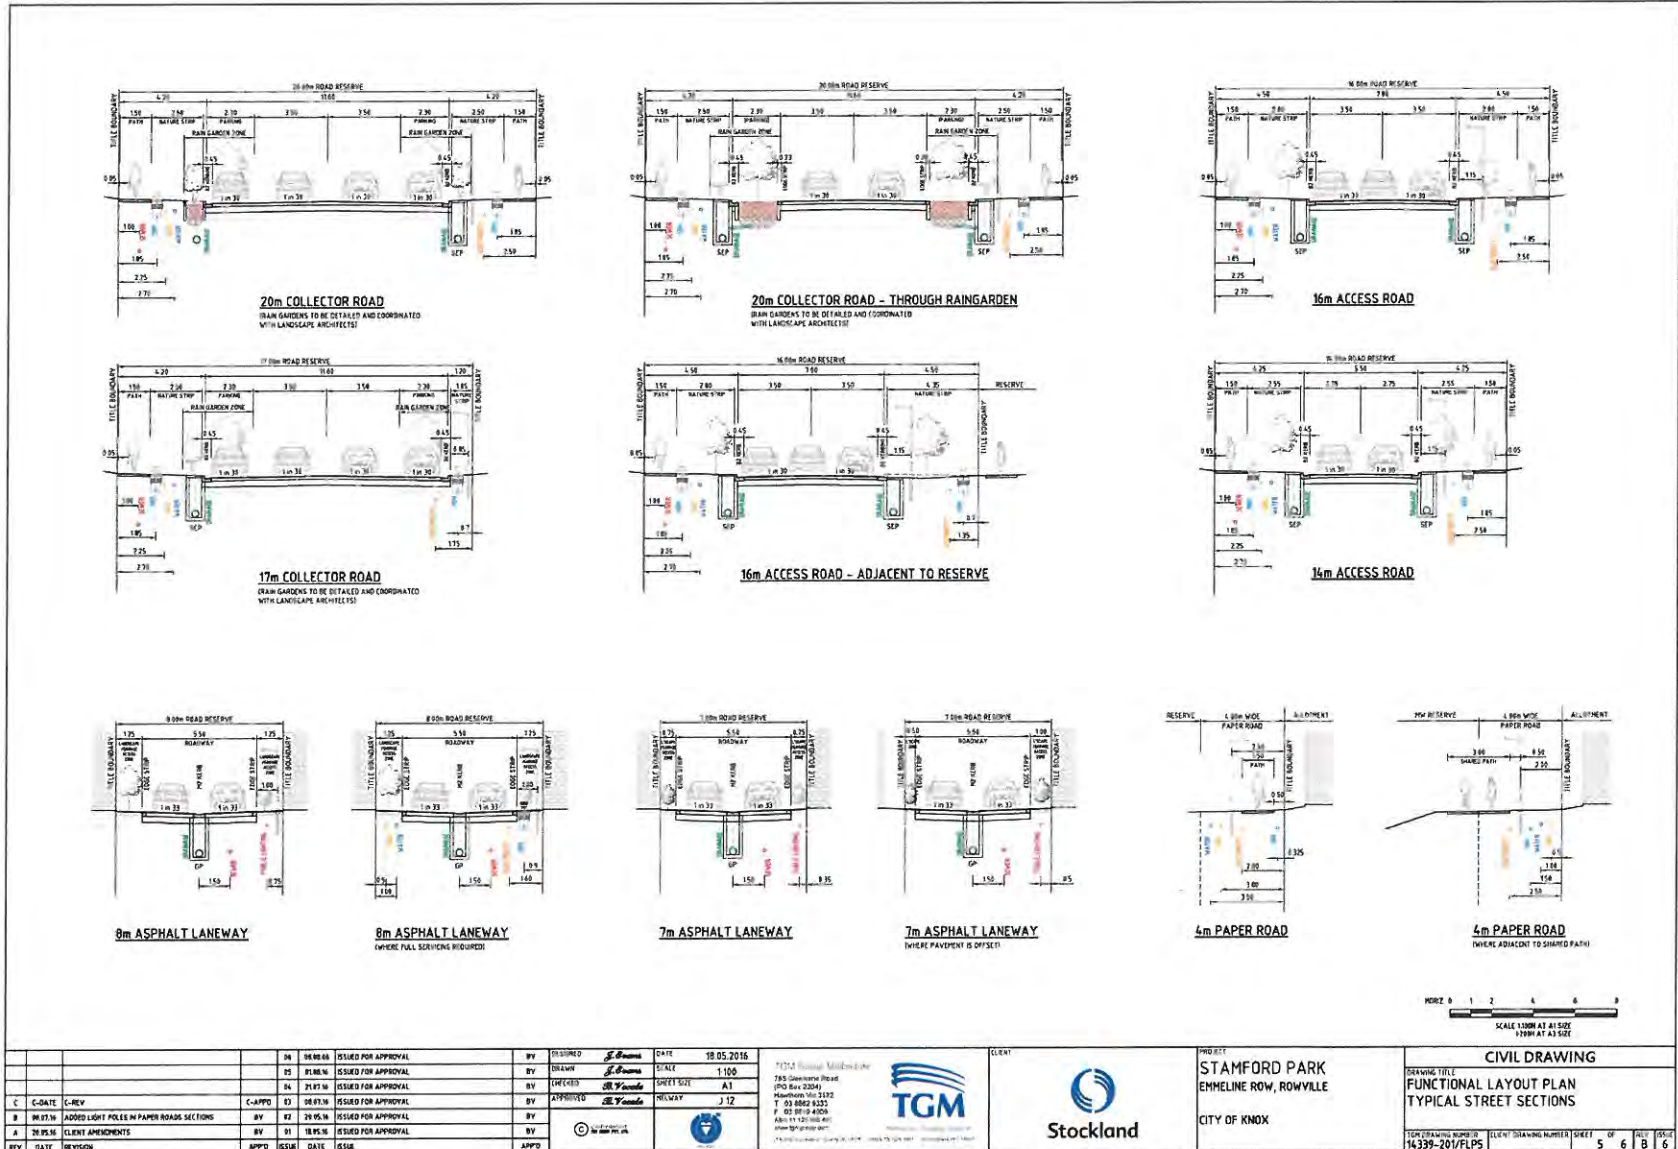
STAMFORD PARK FUNCTIONAL LAYOUT PLAN - STREET SECTIONS [TGM]
